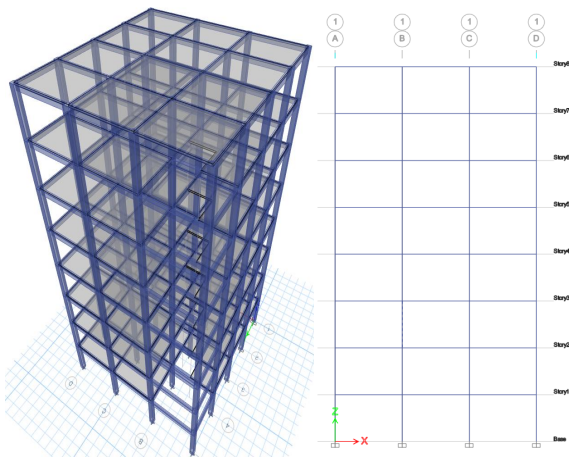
3D view of RC Building (Left), Elevation of RC Building (Right).
